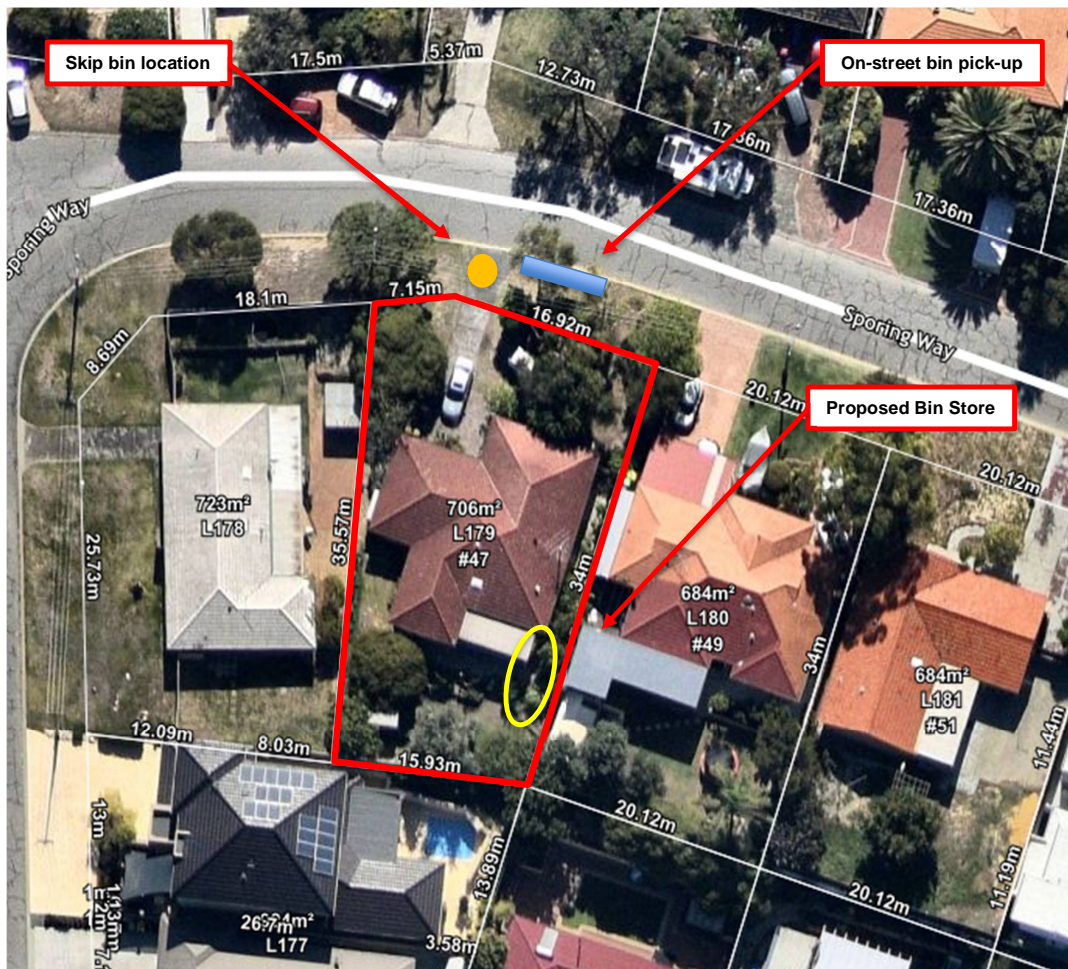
Aerial Site Plan. Location of the bin store on the Subject Land.
